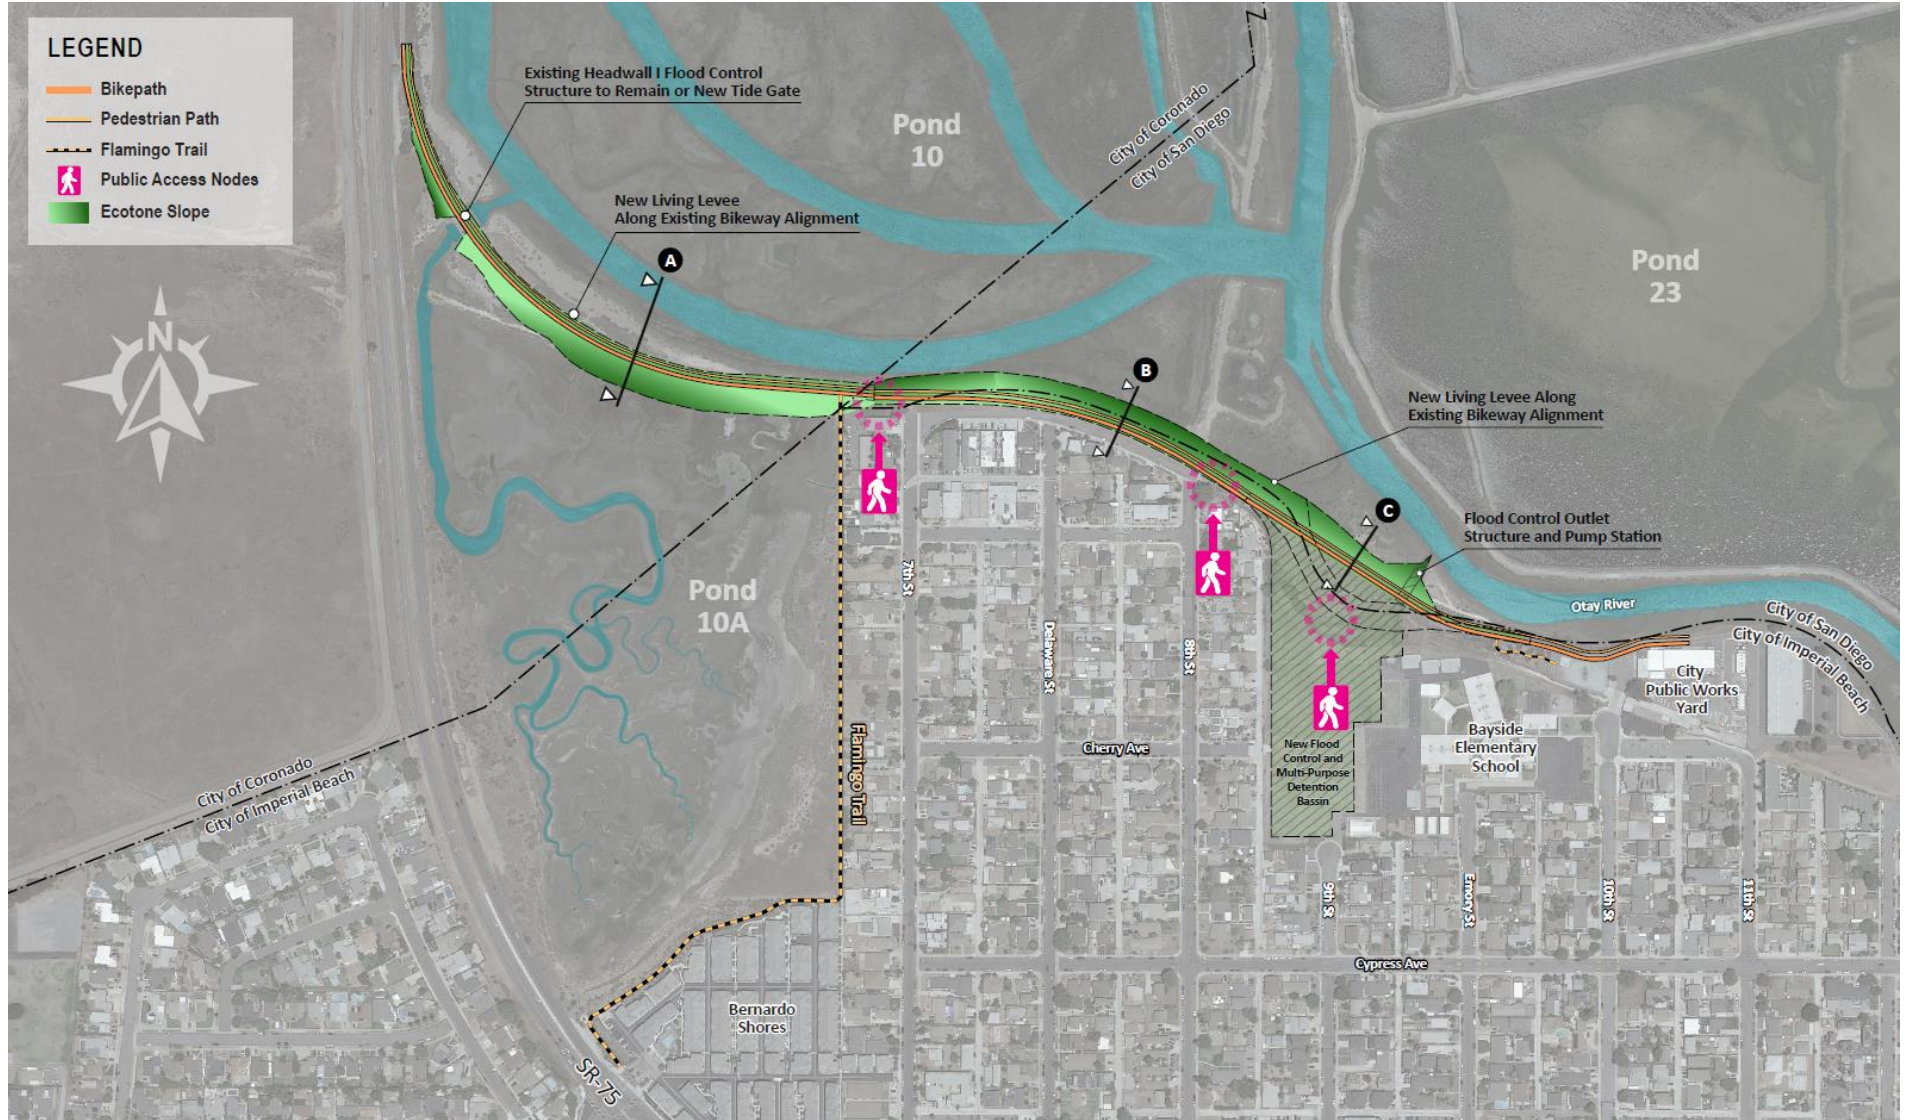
Alternative 1 – “Elevate in Place” Plan View
